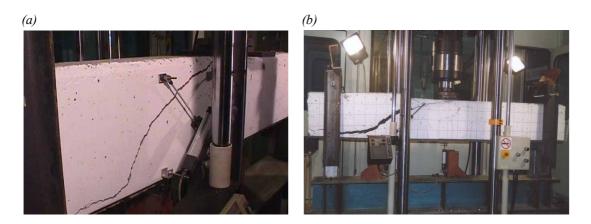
Beam specimens without web reinforcement. Comparison of the final state of cracking in beams H50/1 (a) and H100/1 (b).
